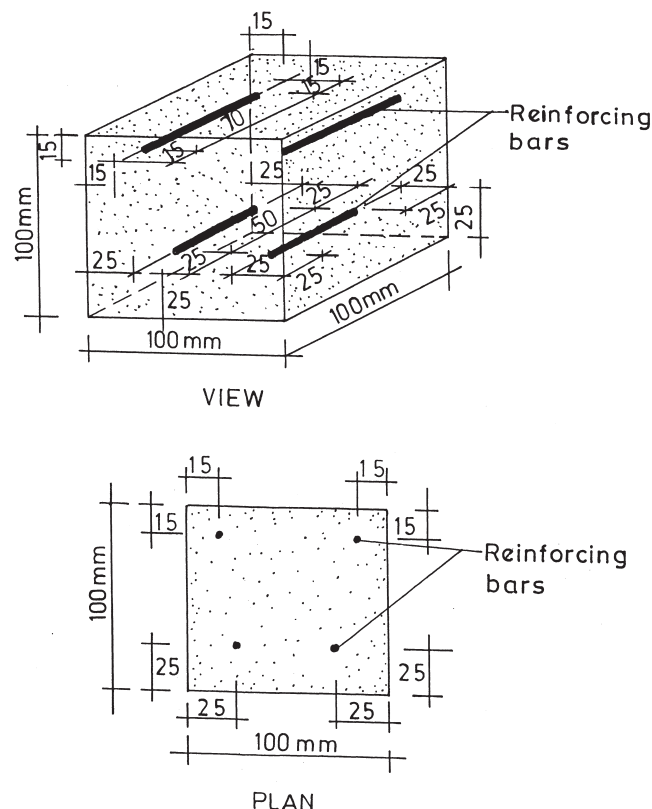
Details of placement of reinforcing bars in concrete cubes.
